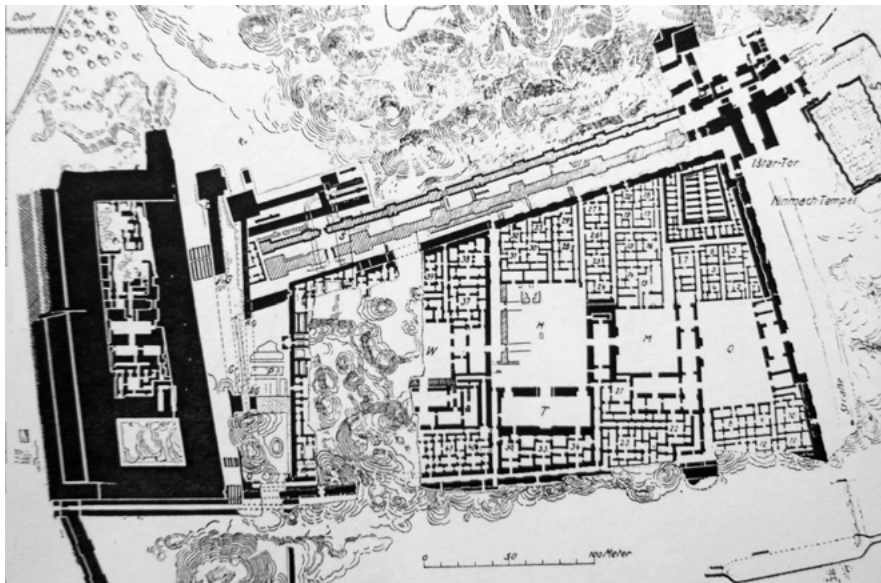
Robert Koldewey, Babylon: ground plan and reconstruction of the temple of Nebuchadnezzar II.
